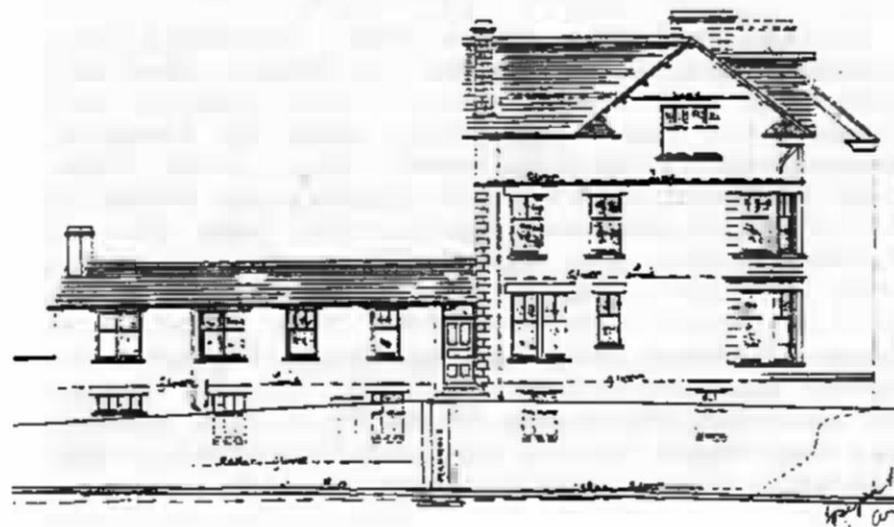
Plan for Robin Hill, 1902. *Front Elevation
